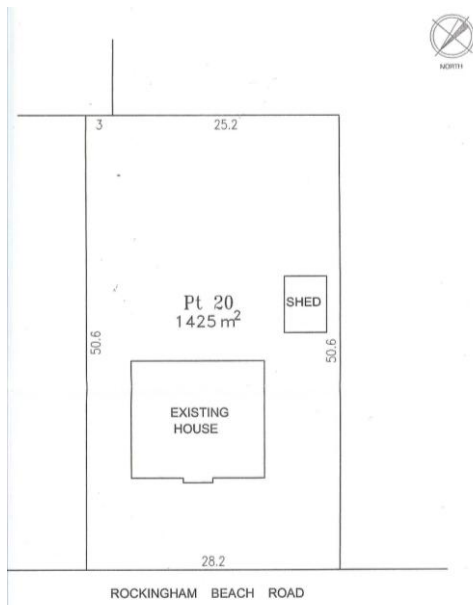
Site Plan. Greg Rowe and Associates 19/04/2002 (City of Rockingham)
